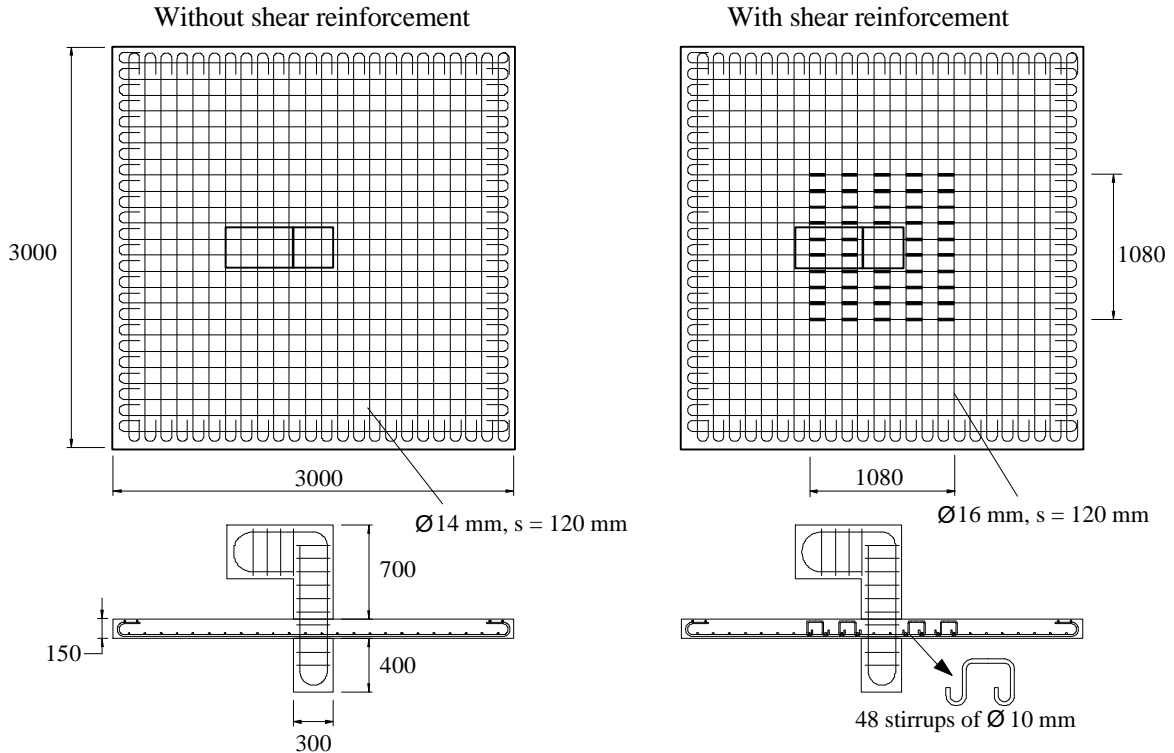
Longitudinal and shear reinforcement (dimensions in mm)
